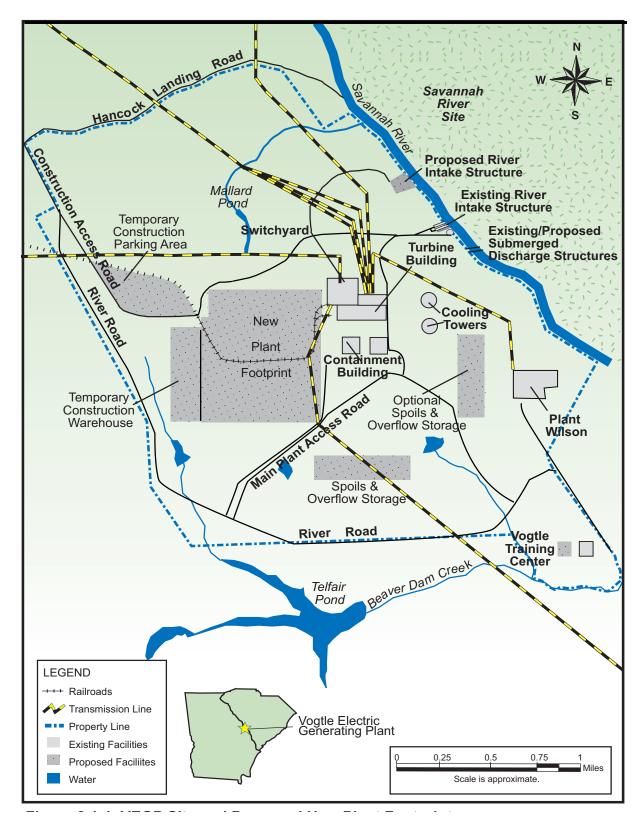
VEGP Site and Proposed New Plant Footprint
